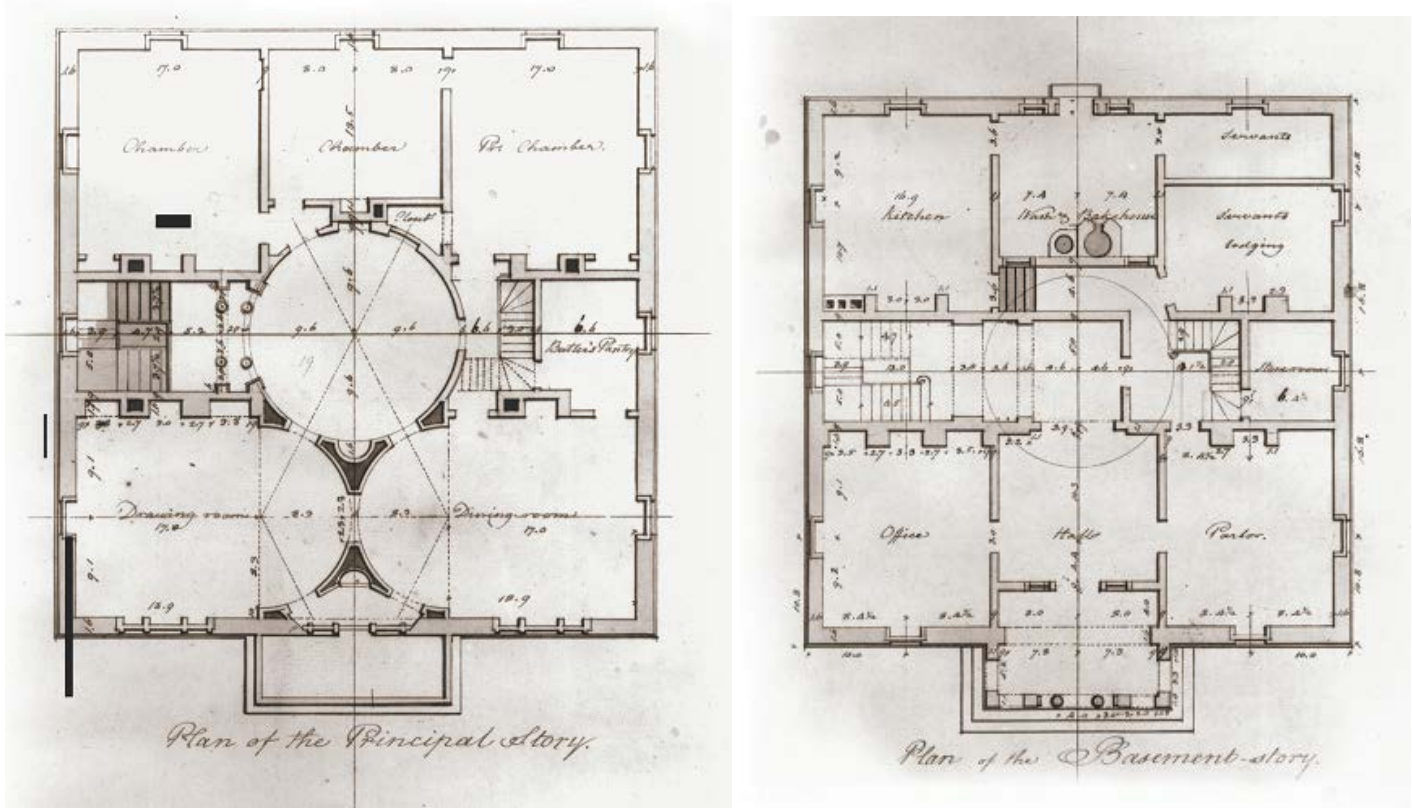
Upper floor plan and first floor (Basement-story) plan.
